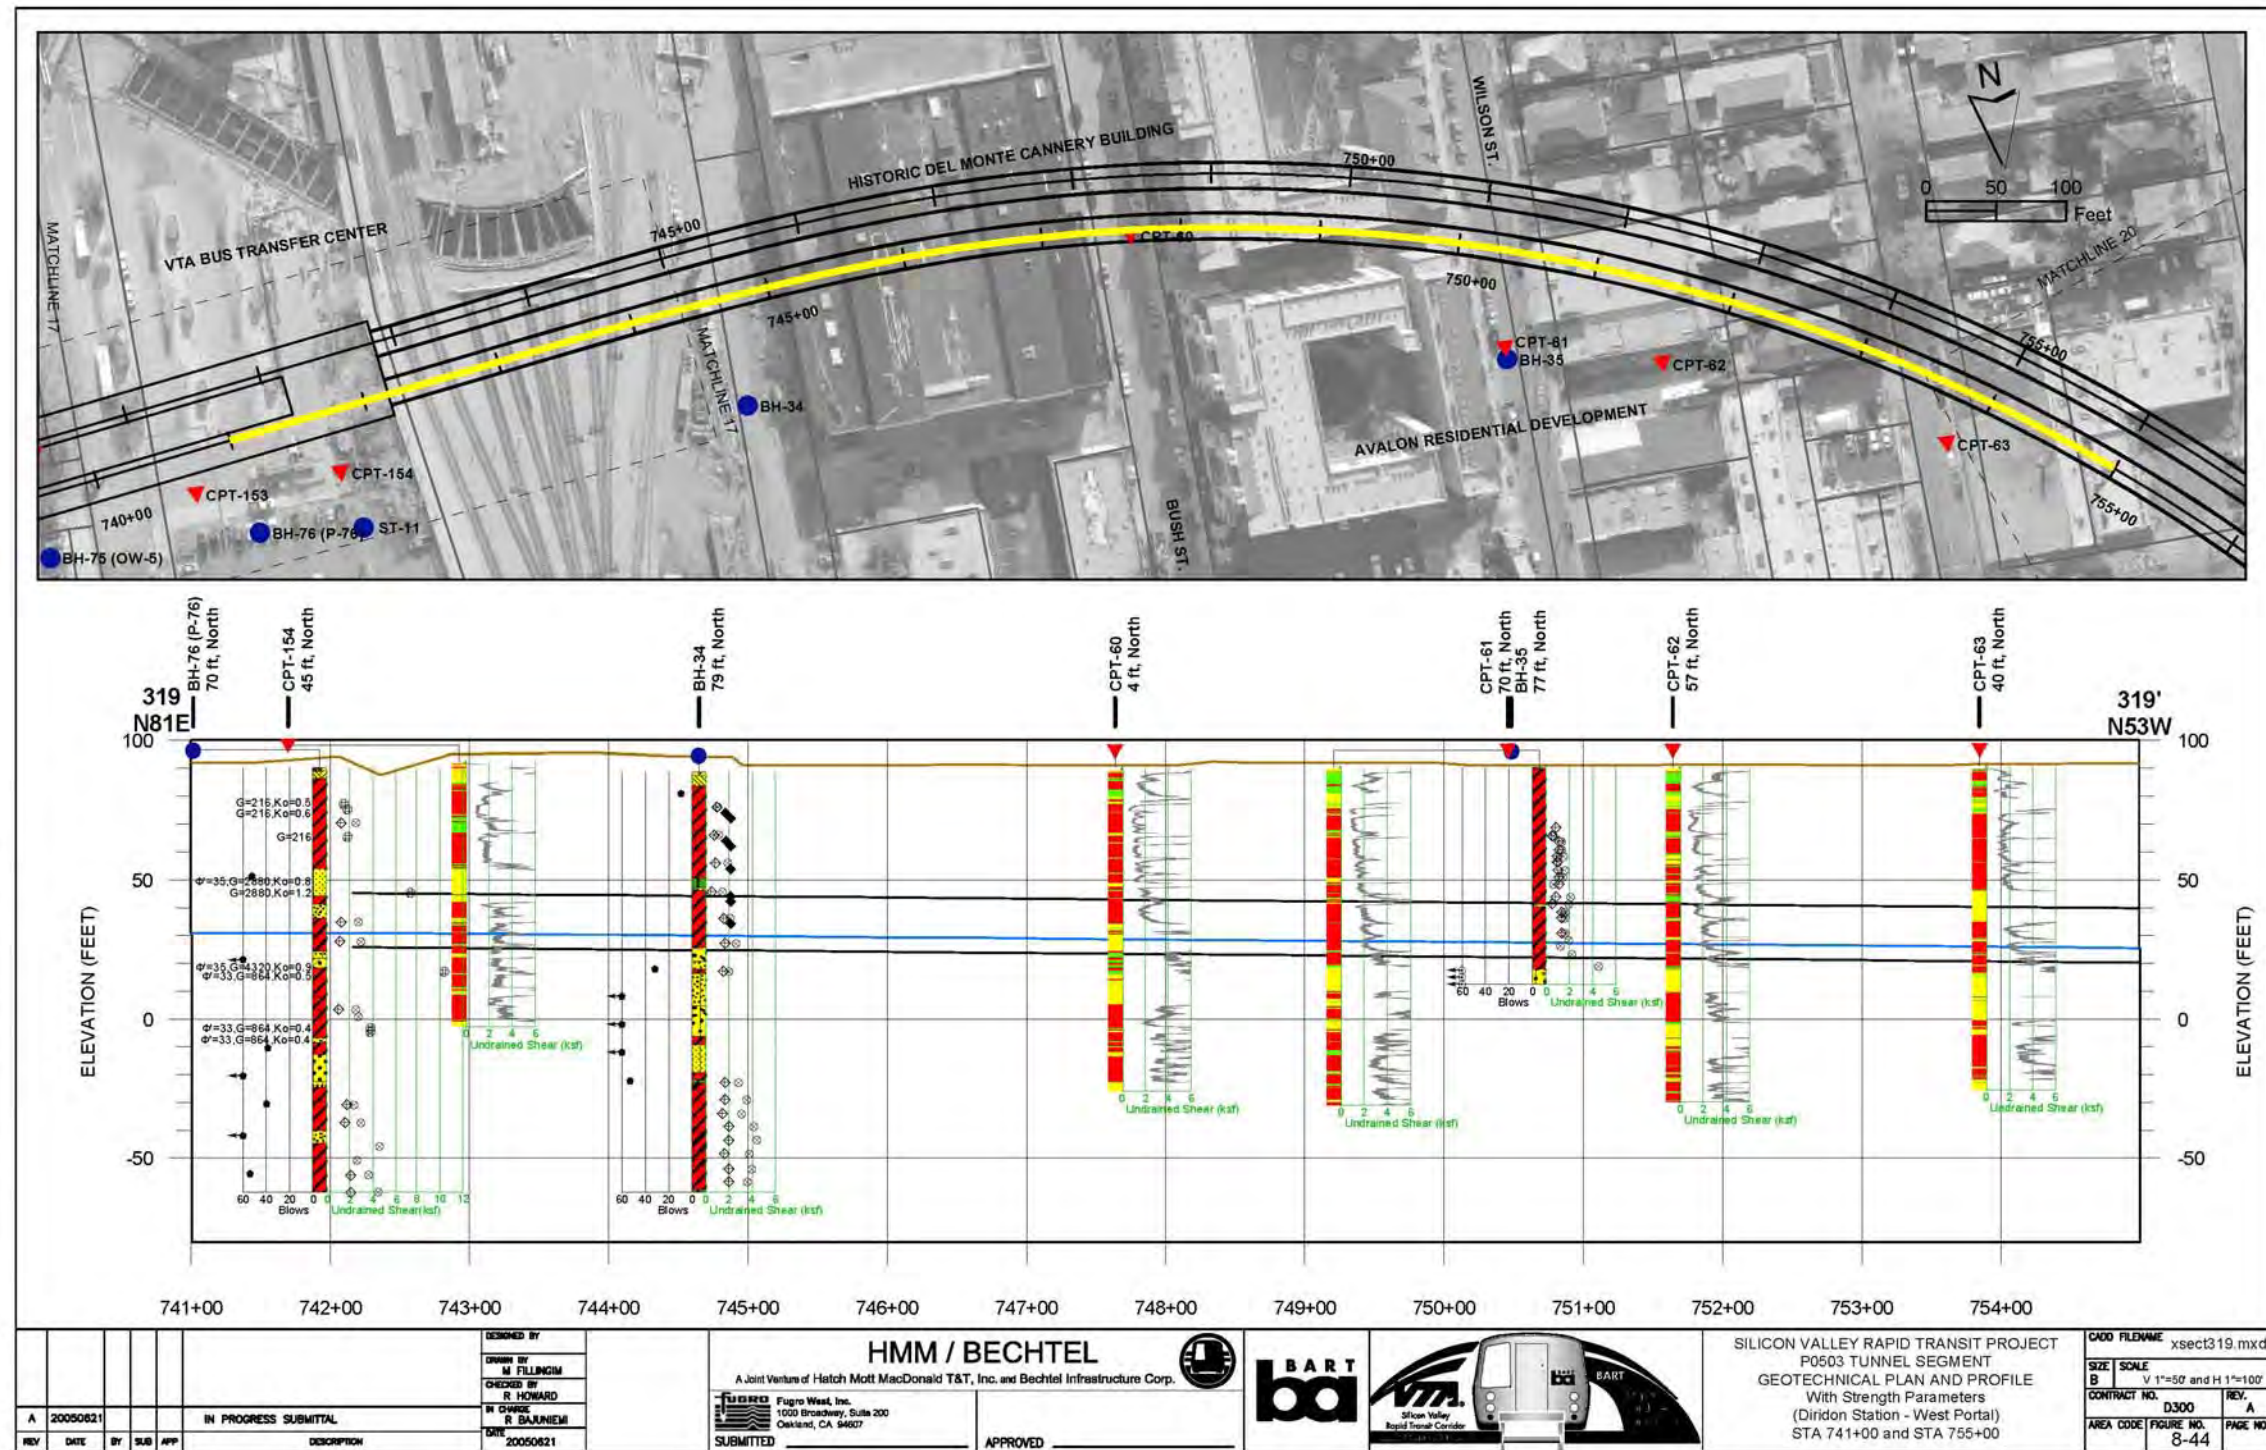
Geotechnical Plan and Profile with Strength Parameters: 741+00 to 755+00.
